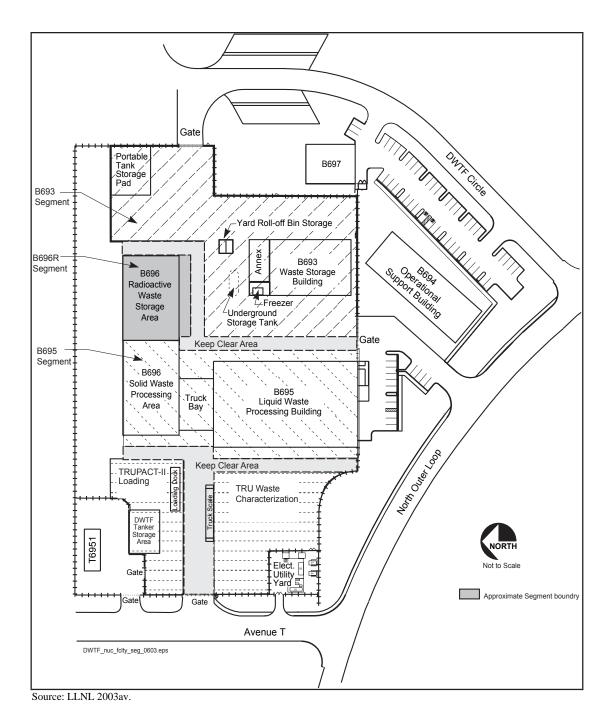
Decontamination and Waste Treatment Facility
